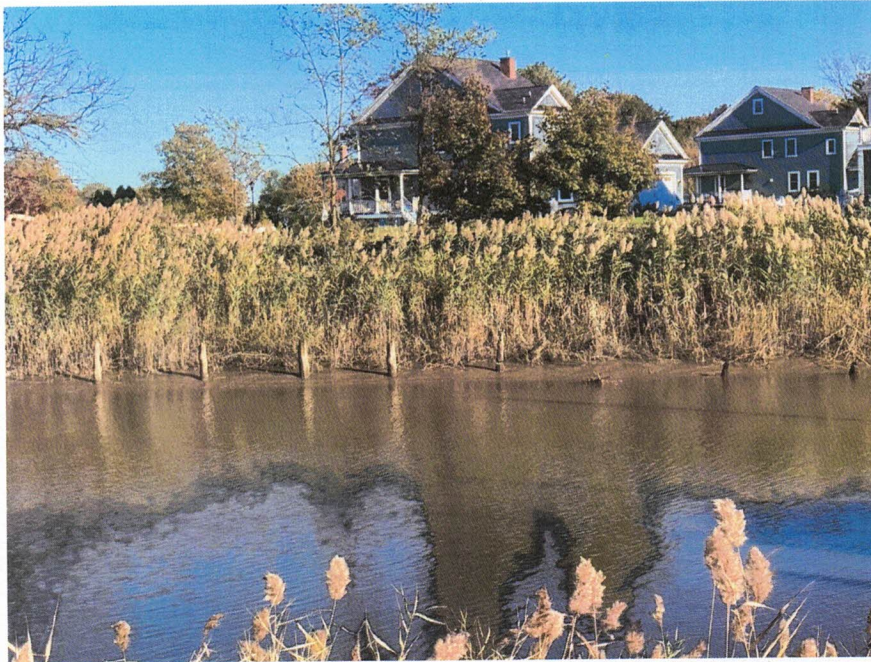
Seen in front of the phragmites are existing old piles of previous construction of the Chesapeake and Delaware Canal. This area is within the slope stabilization work site. The locations of these piles are faint and difficult to see on the Scaled Plan View of the application. The piles are shown in the background of the contour lines on the Scaled Plan Views.
